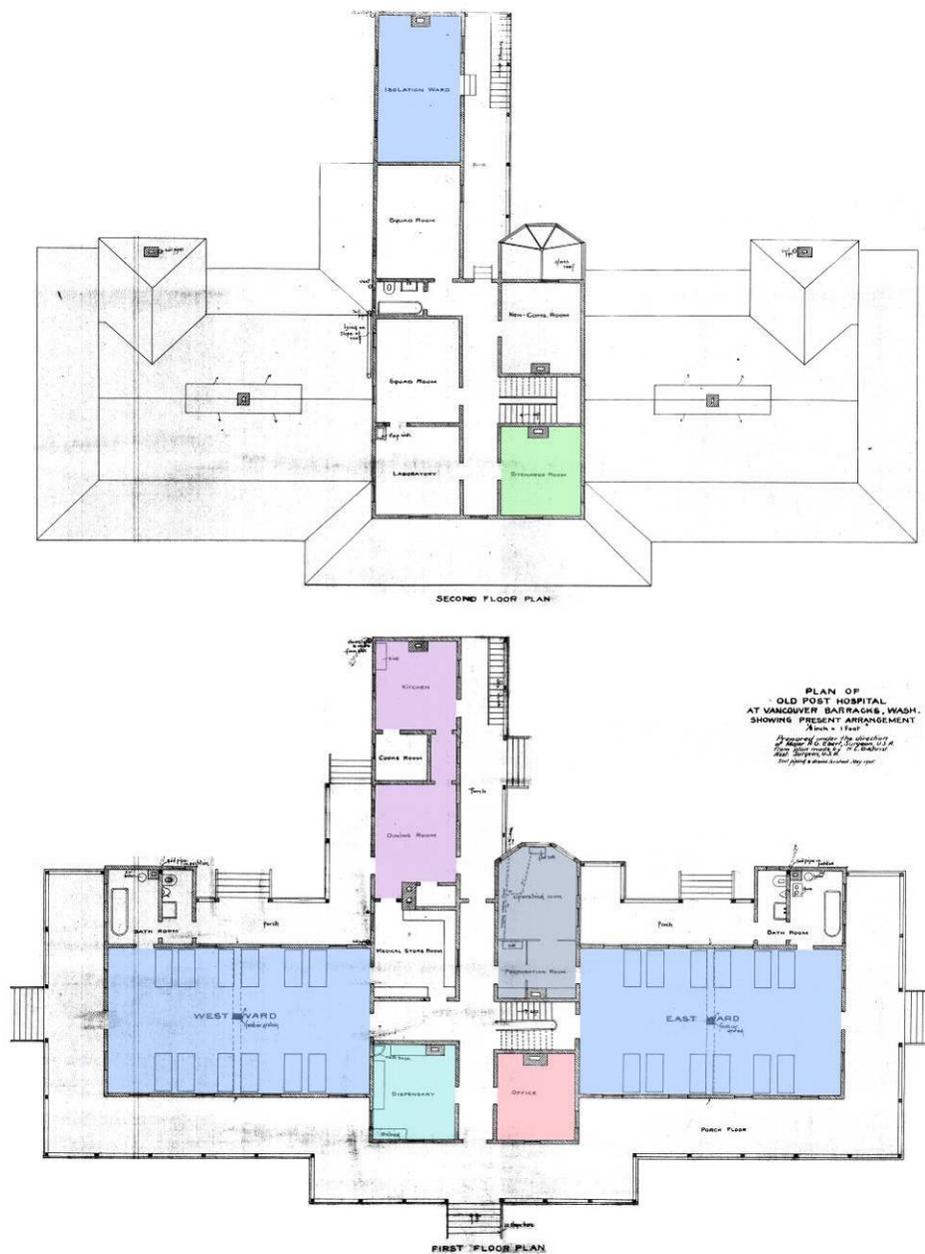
Hospital floor plans, Vancouver Barracks, Washington, 1905 (NARA College Park, RG 77 MISC Fort Files Vancouver Barracks WA).
